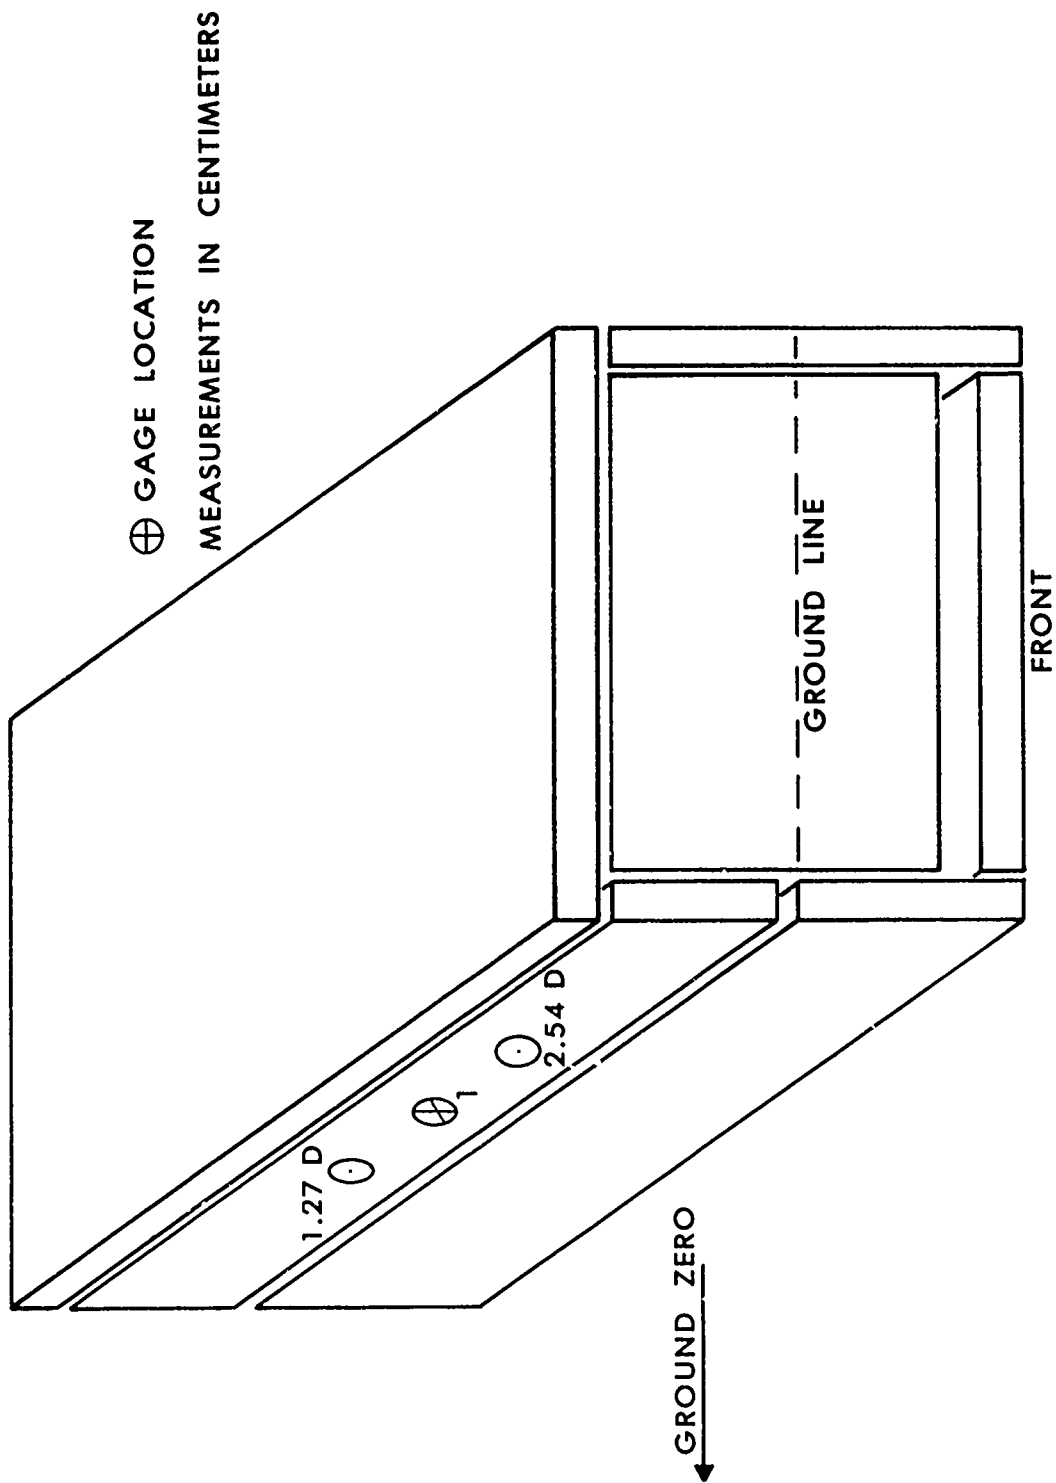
Acceptor Model with a nonresponding Steel Plate Containing Holes for Two Concrete Plugs
